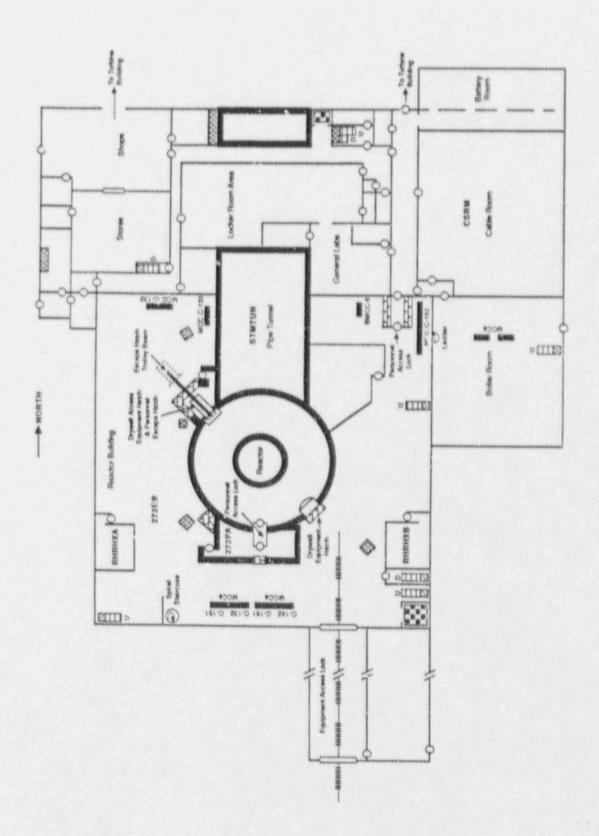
Reactor and Administration Buildings, Elevation 272'0"
